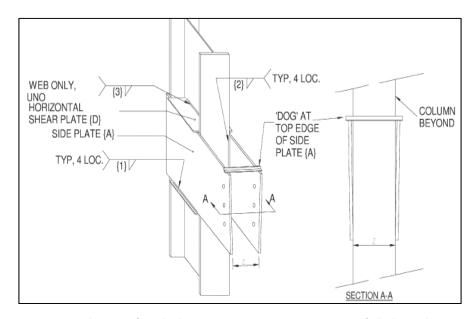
3D drawing of a Sideplate Frame System. Image courtesy of Ellerbe Becket.
